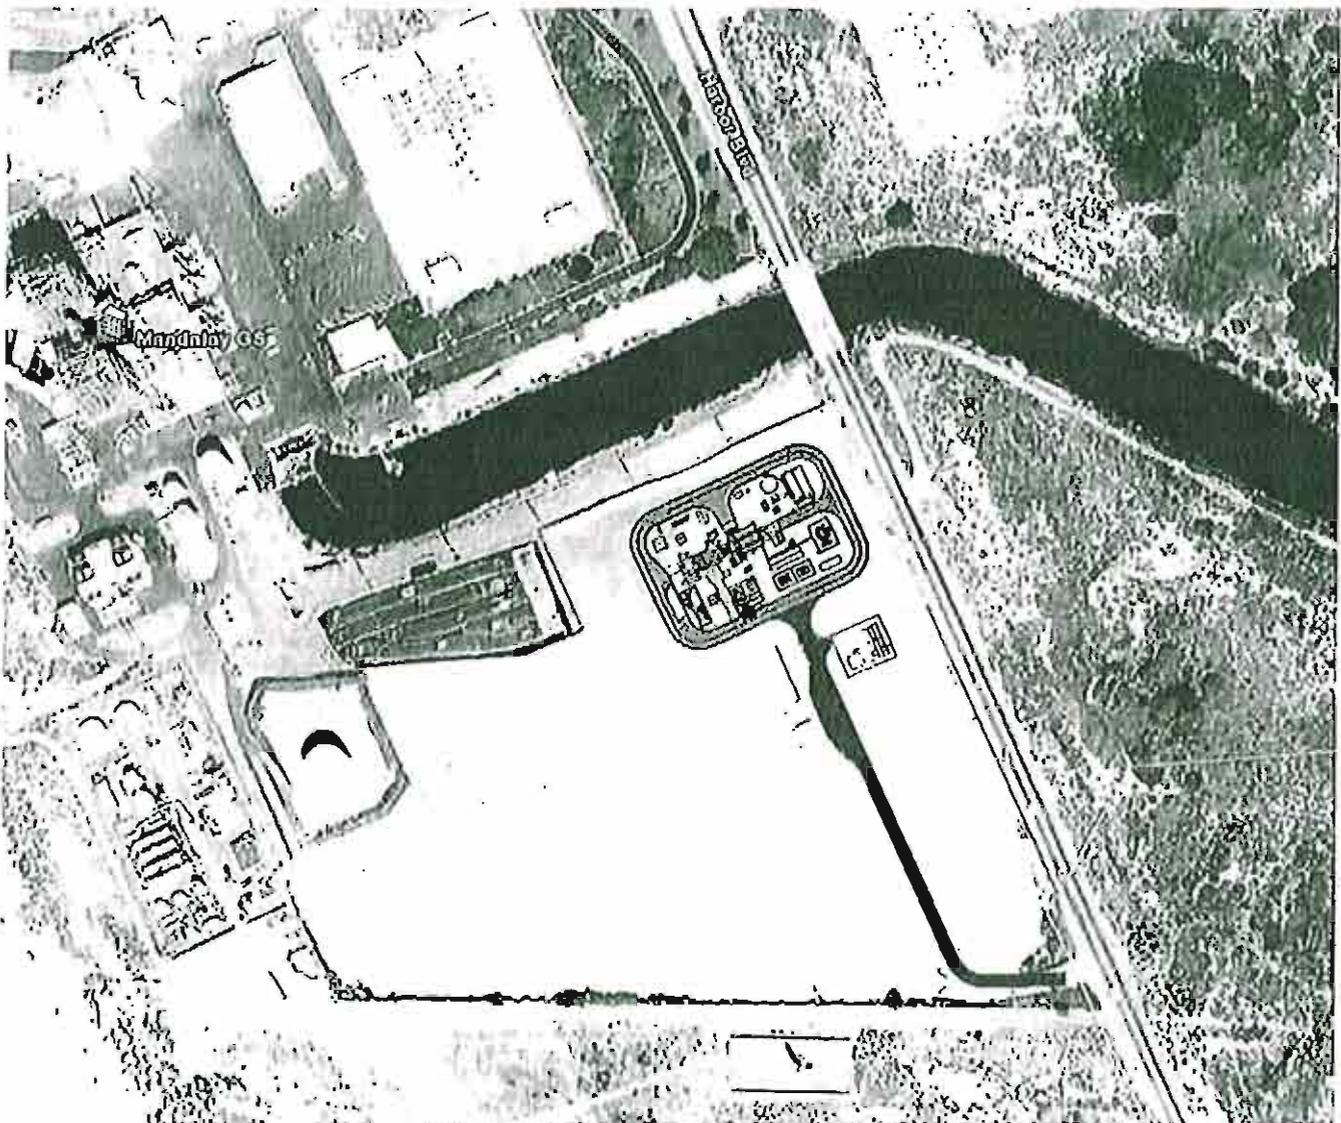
Aerial Photograph of the Facility with Facility Plot Plan
